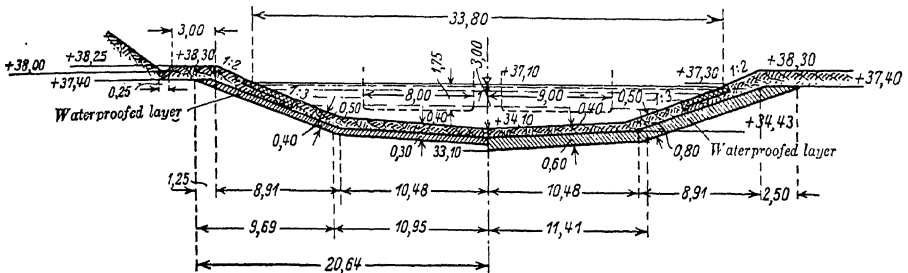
Cross-section through waterproofed stretch. Trunk-line waterway from Berlin to Stettin
